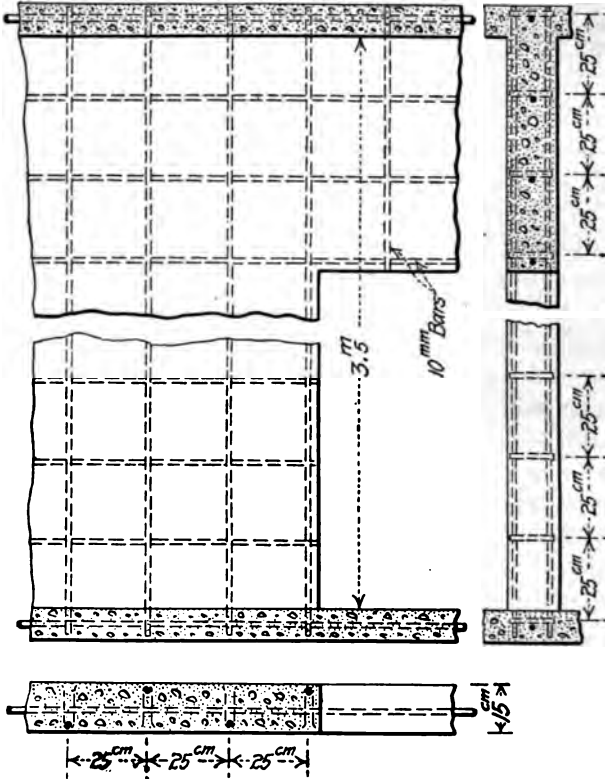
Wall Construction for Bank Building at Basel, Switzerland.
